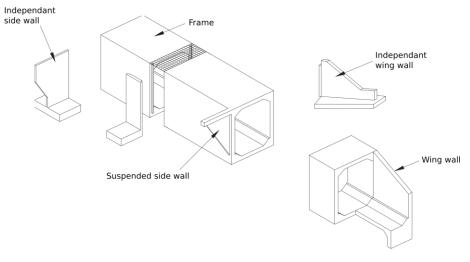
Examples of retaining walls for a rigid frame (adapted from « Dictionnaire de l'entretien routier. Volume 5 : ouvrages d'art », Cerema, 2008)
